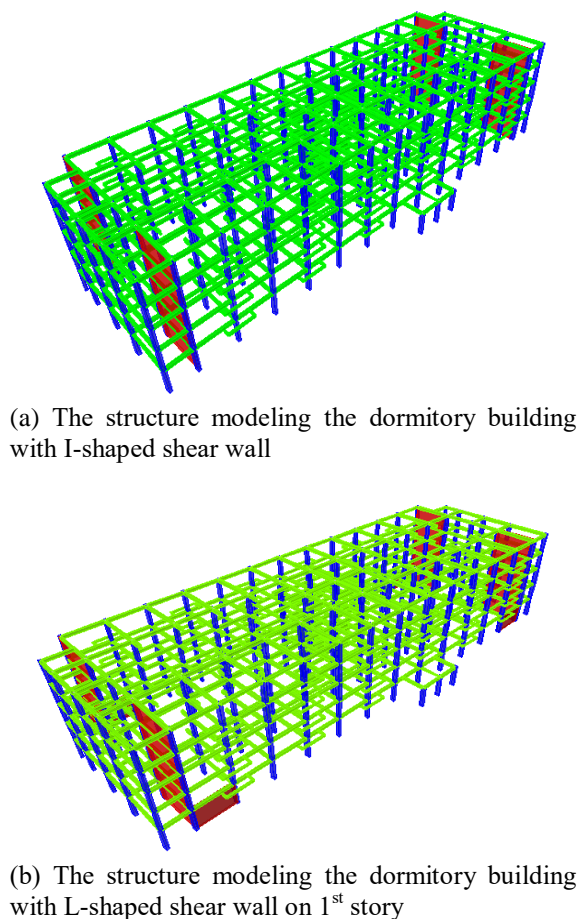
The plan of the dormitory building with I-shaped and L-shaped shear walls.
